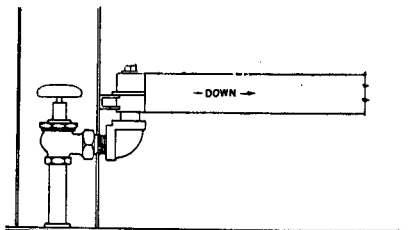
Using Angle Valve outside Recess when pipe space is provided.
